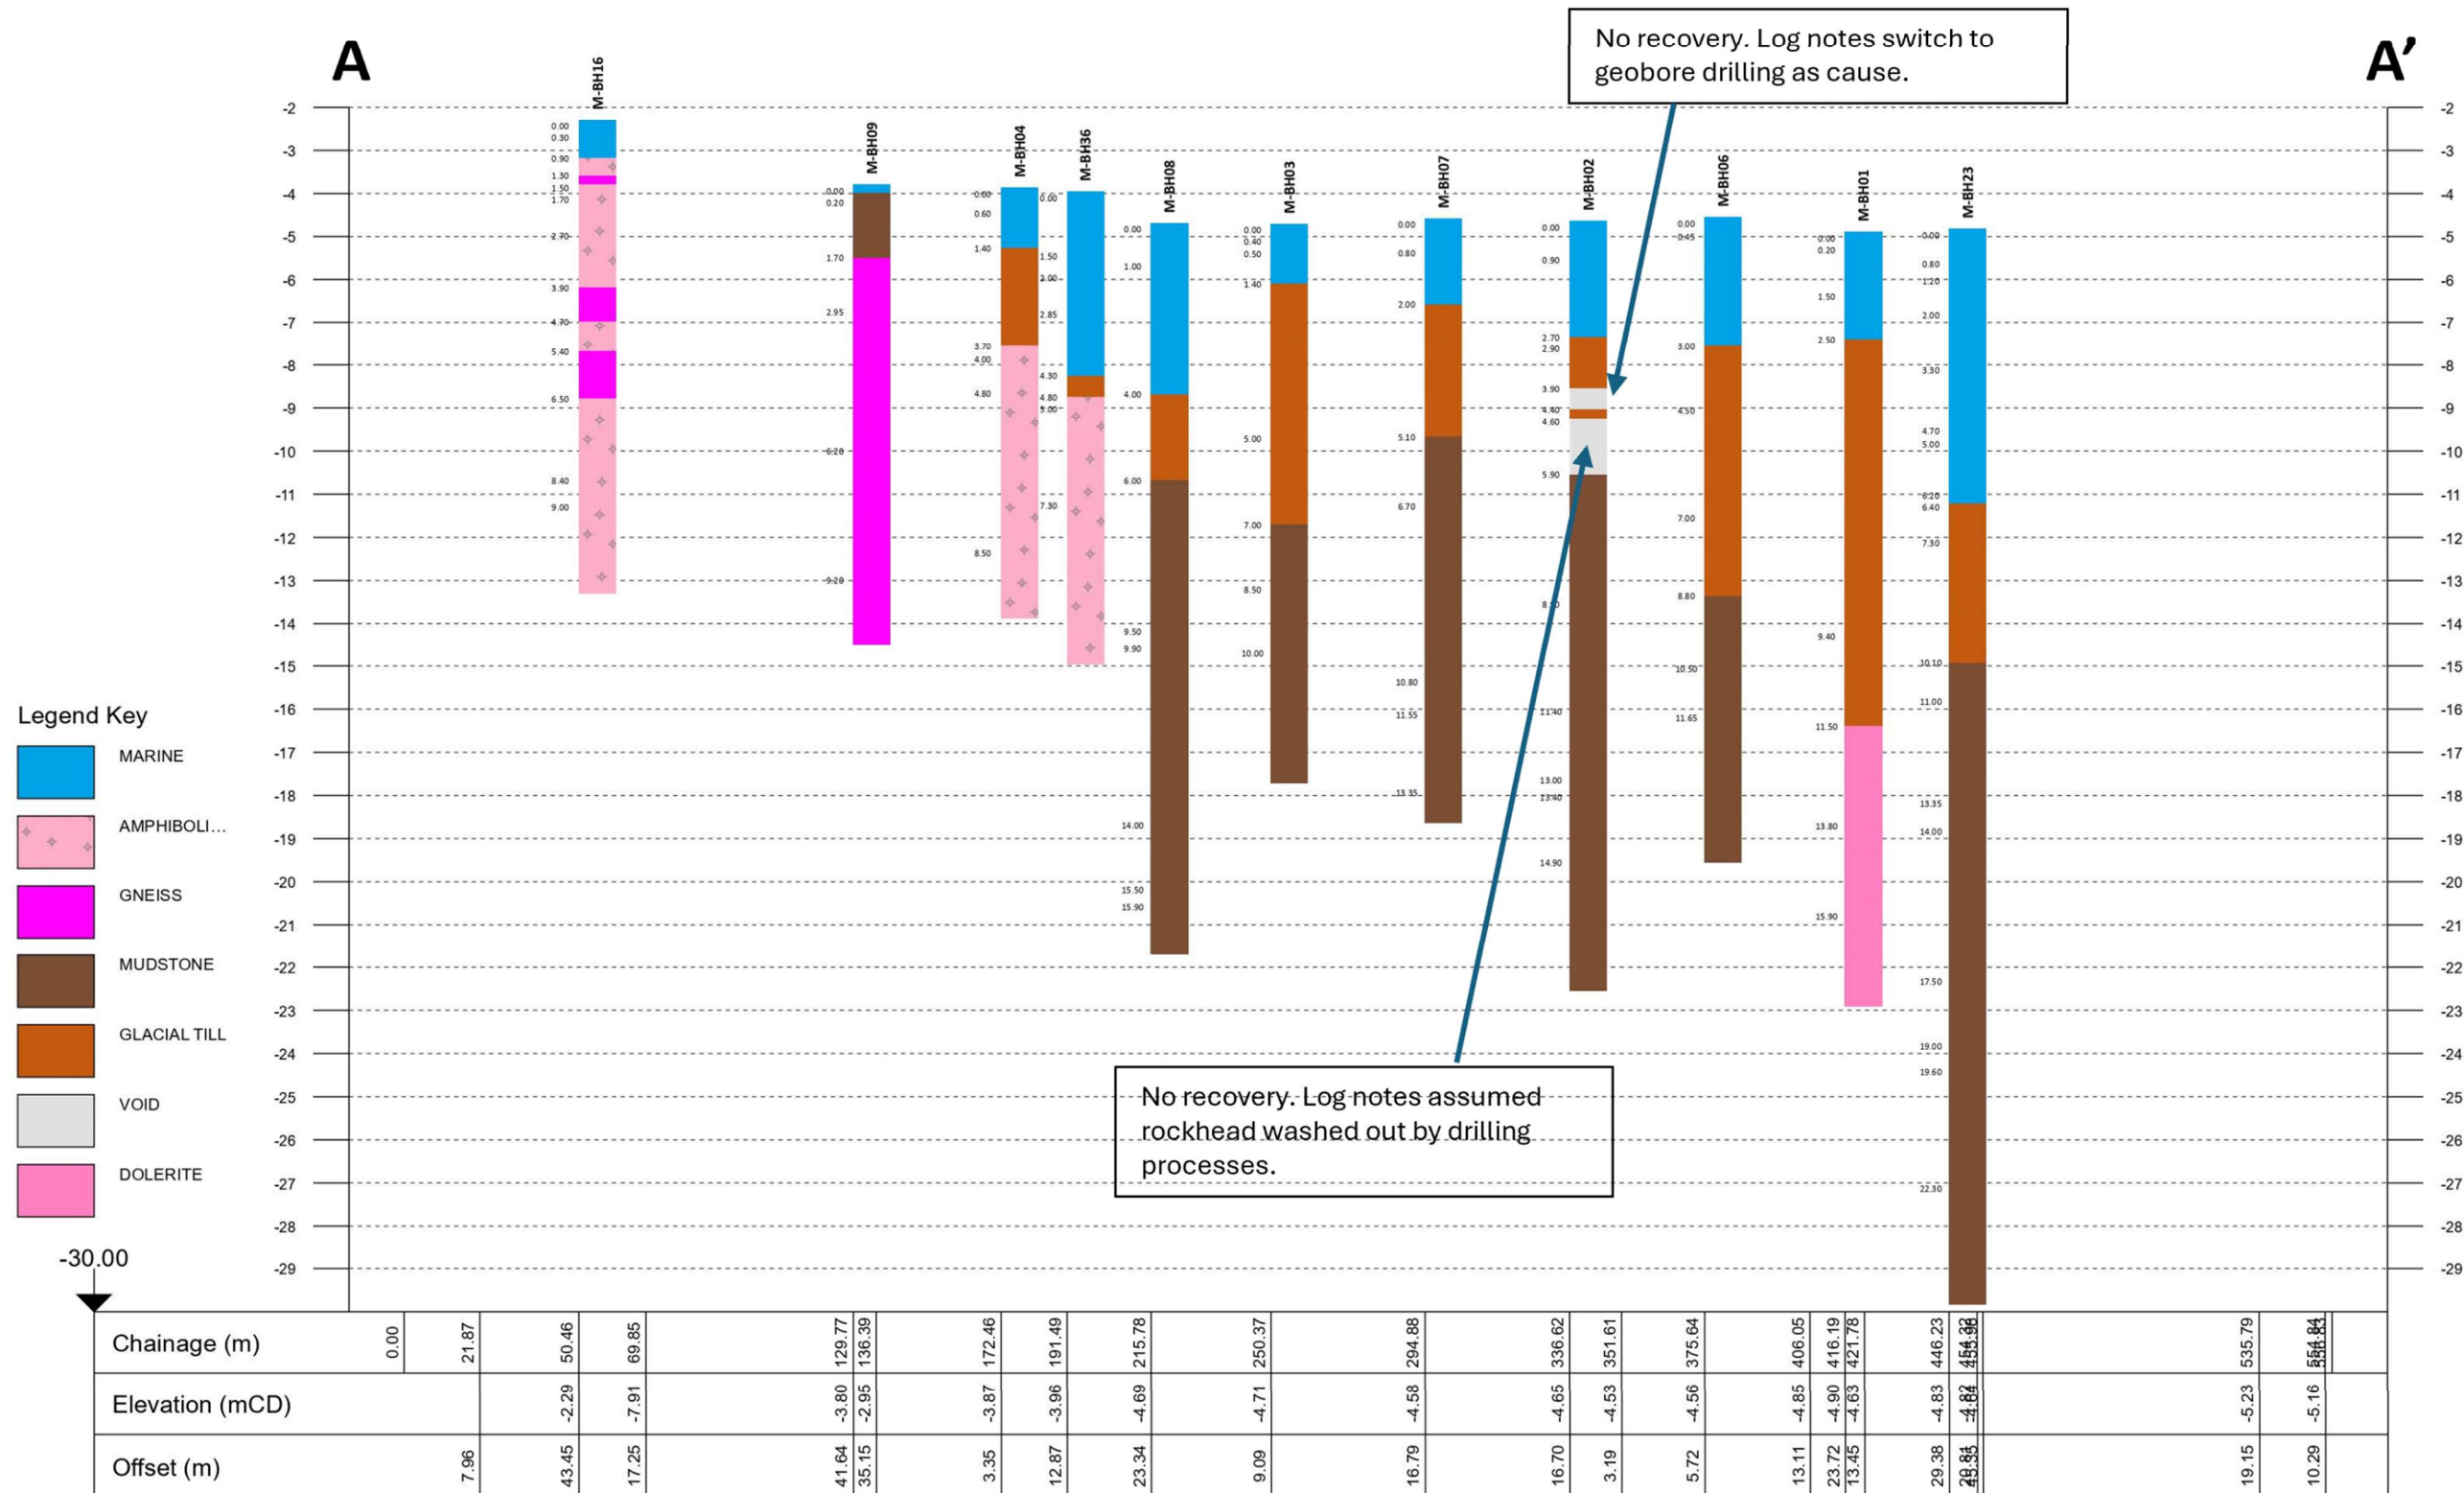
Cross Section based on the marine boreholes at the proposed quay wall.
